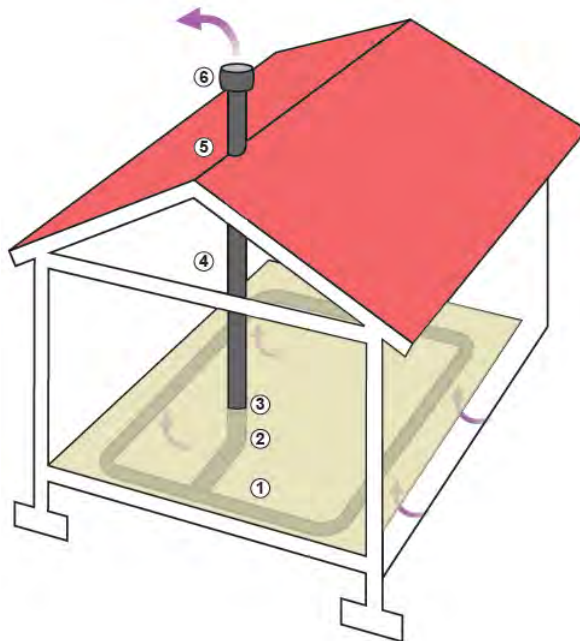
An example of an effective radon prevention in new house. Radon piping is installed below the floor slab. The joint between the floor and wall is also sealed as well as pipe penetrations.
